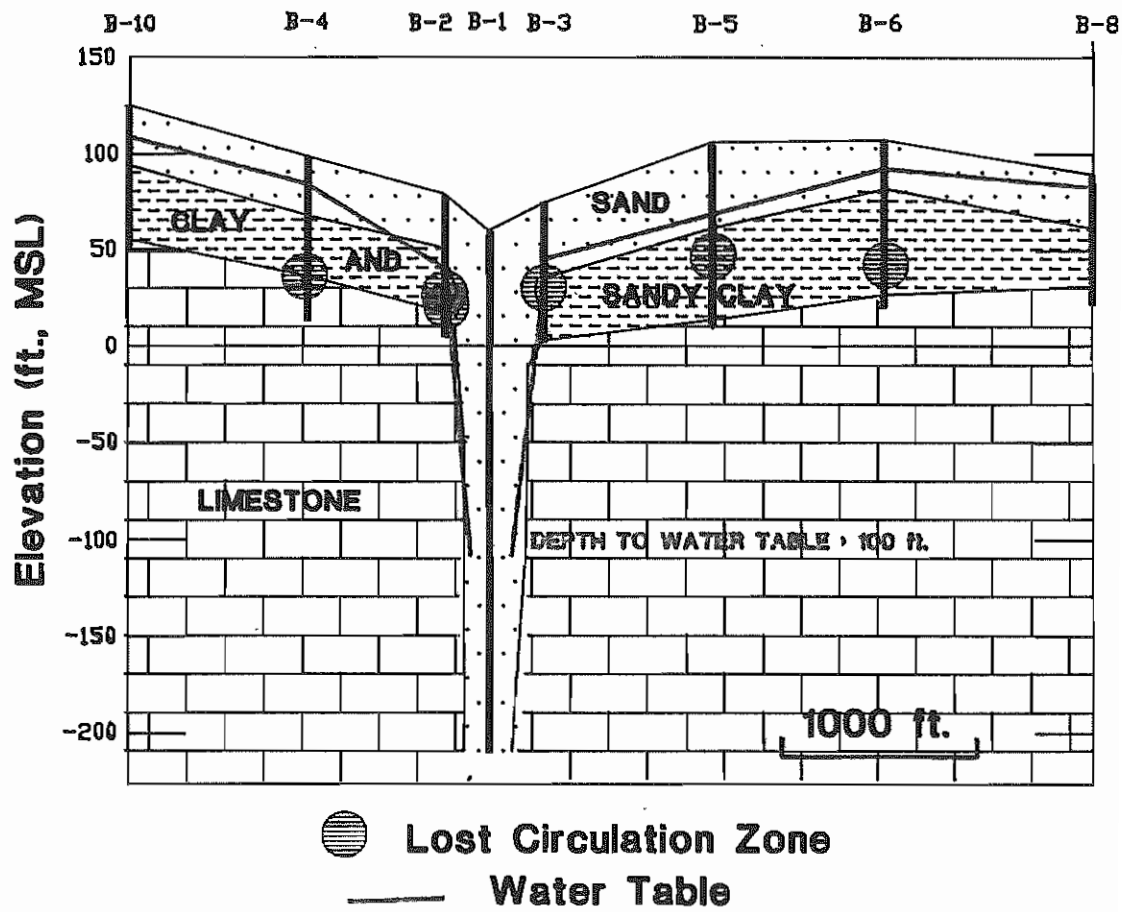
Cross Section through the Mulrennan Road Sinkhole.
